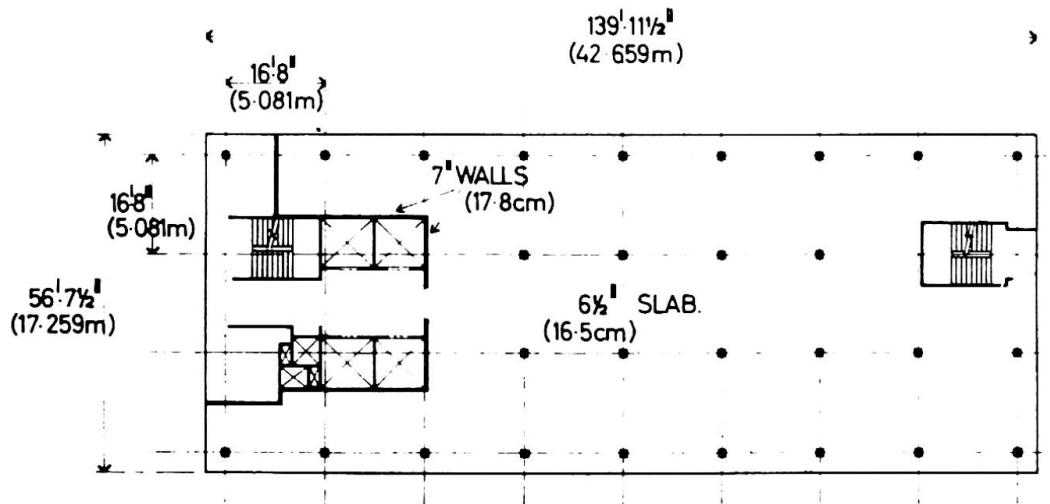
MOOR HOUSE — TYPICAL FLOOR PLAN
